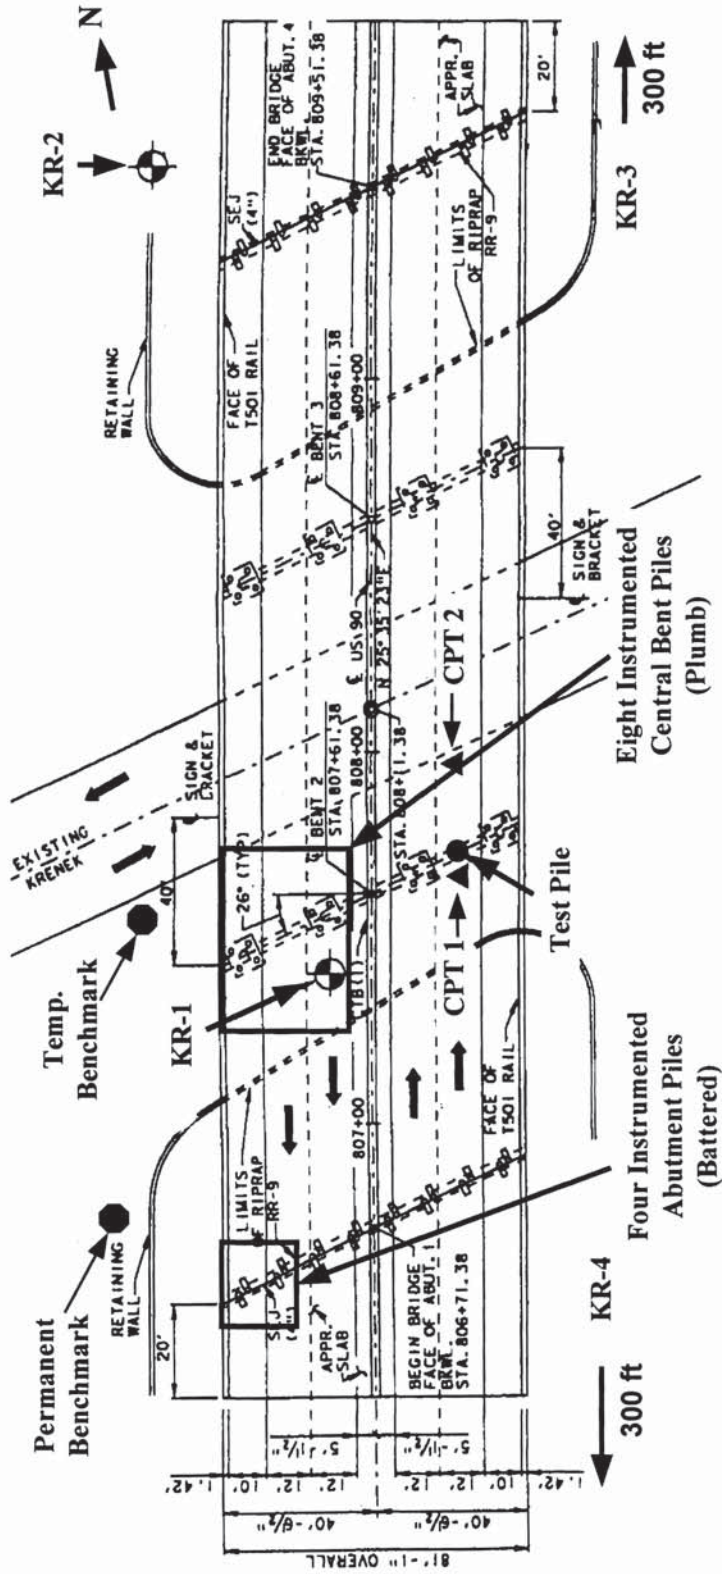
Krenek Road Bridge Layout (Adapted from TxDOT)
